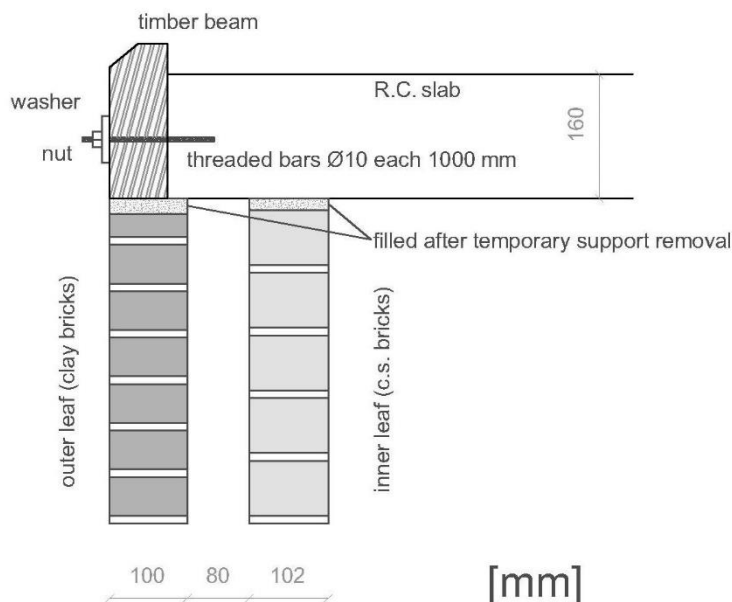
Detail of the connection between the r.c. slab of the second floor and the inner leaf (c.s. walls) - East and West side
